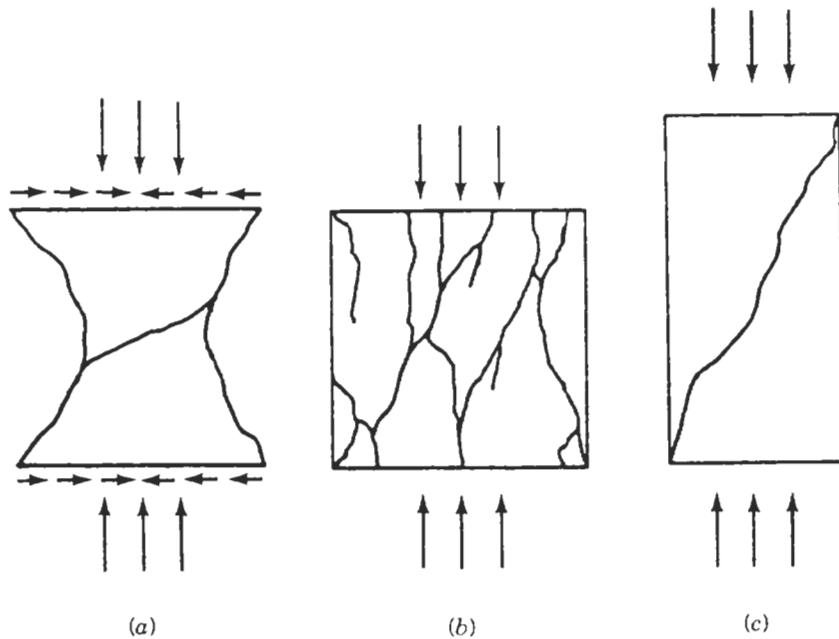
Failure modes of concrete specimens under uniaxial compression.^{8,9}
